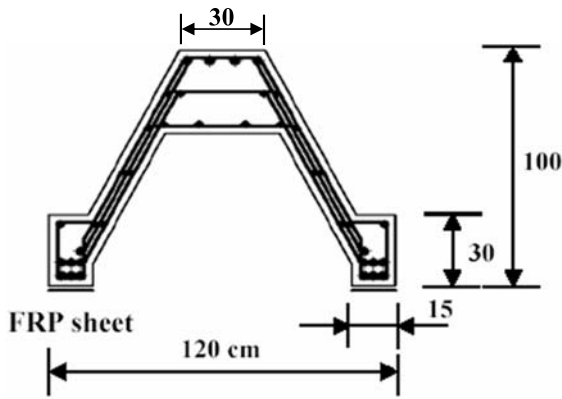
In situ* retrofitted RC beam test. Scheme of the beam cross-section
